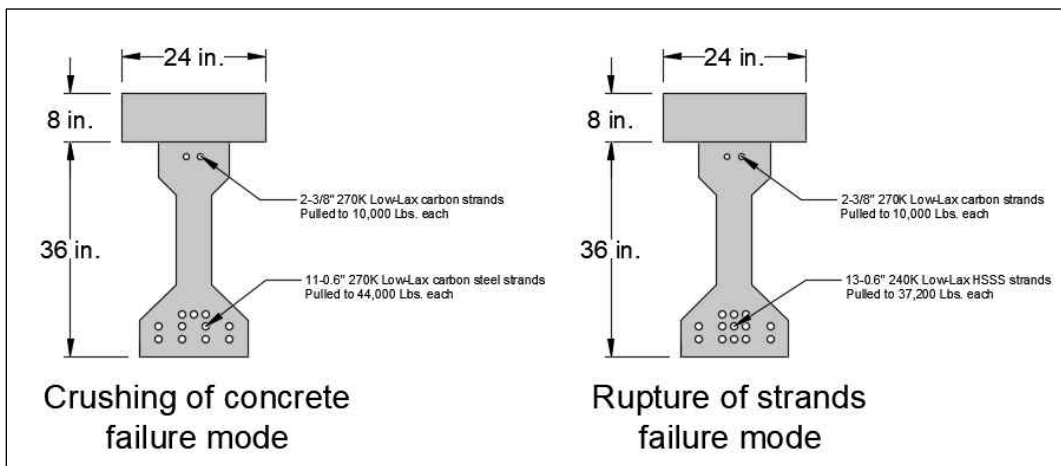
Cross sections of two girders: 11 carbon steel strands with crushing of concrete failure and 13 HSSS strands with rupture of strands failure
